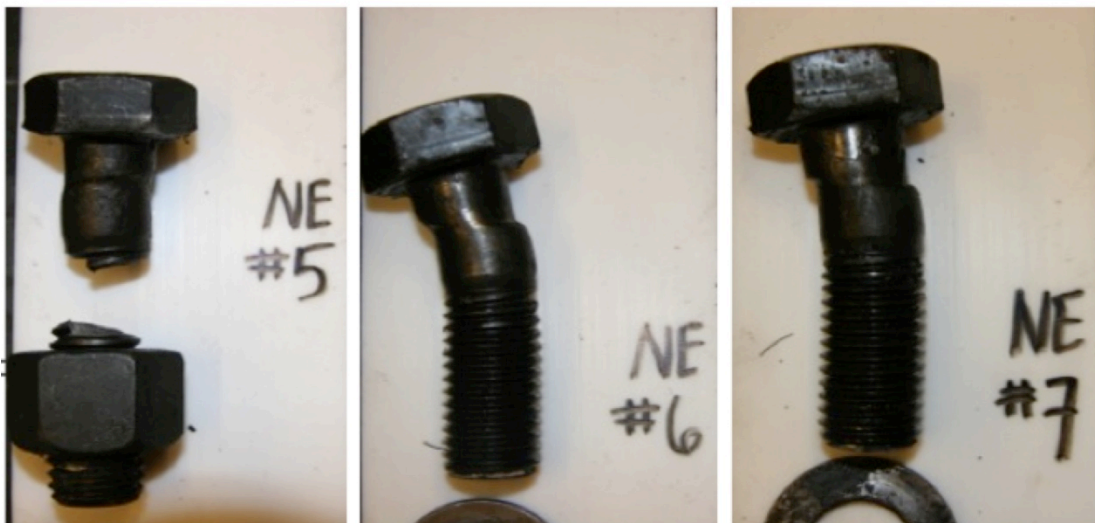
Bolt Damage in NE Gusset Plate
